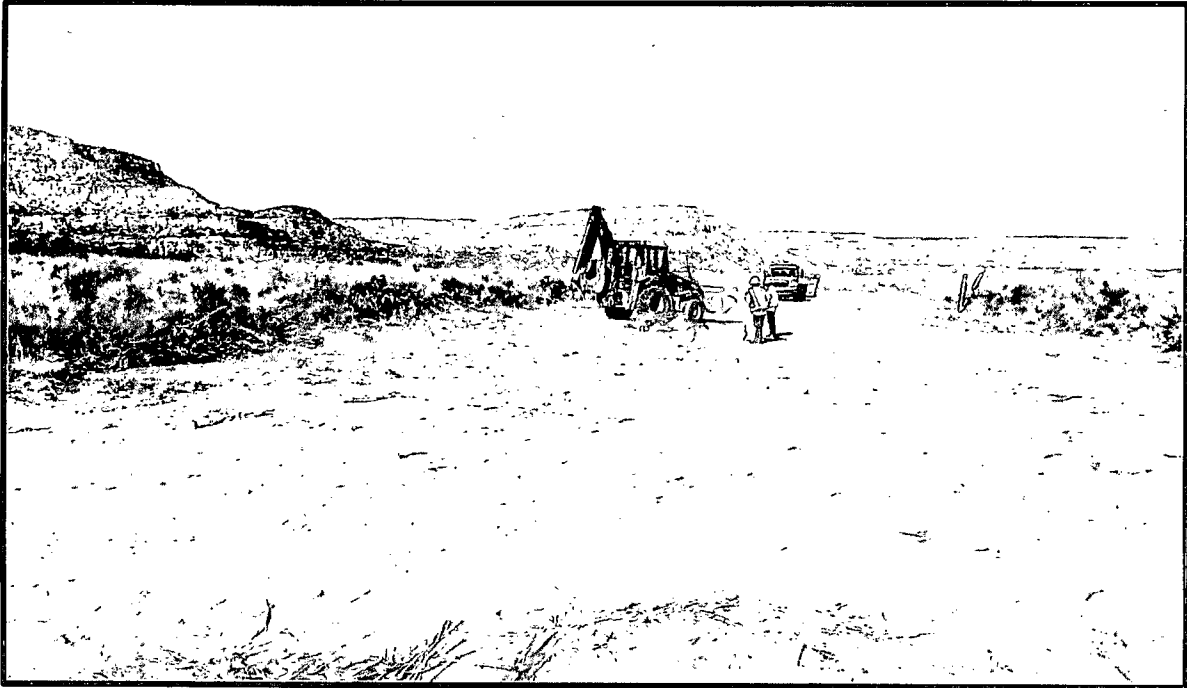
The Trunk K #7 release site being prepared for excavation activities.
